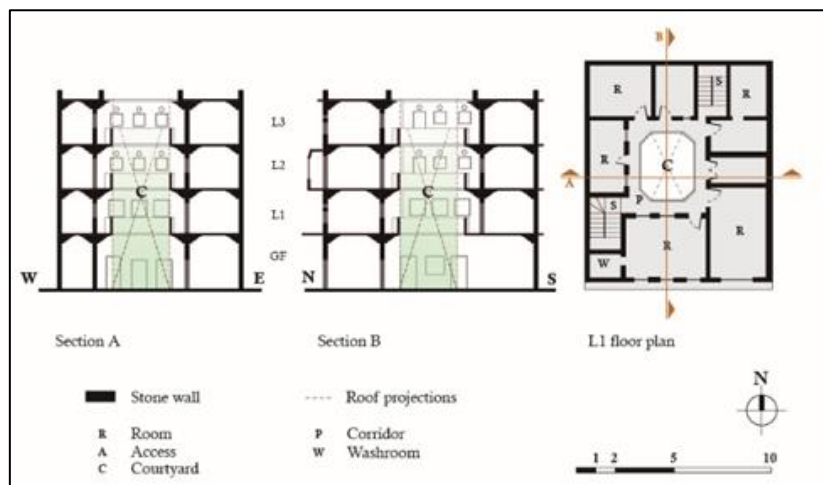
Plan and Section of Identified Vernacular Building, Tatiwali haveli at Latitude 26.9°N
